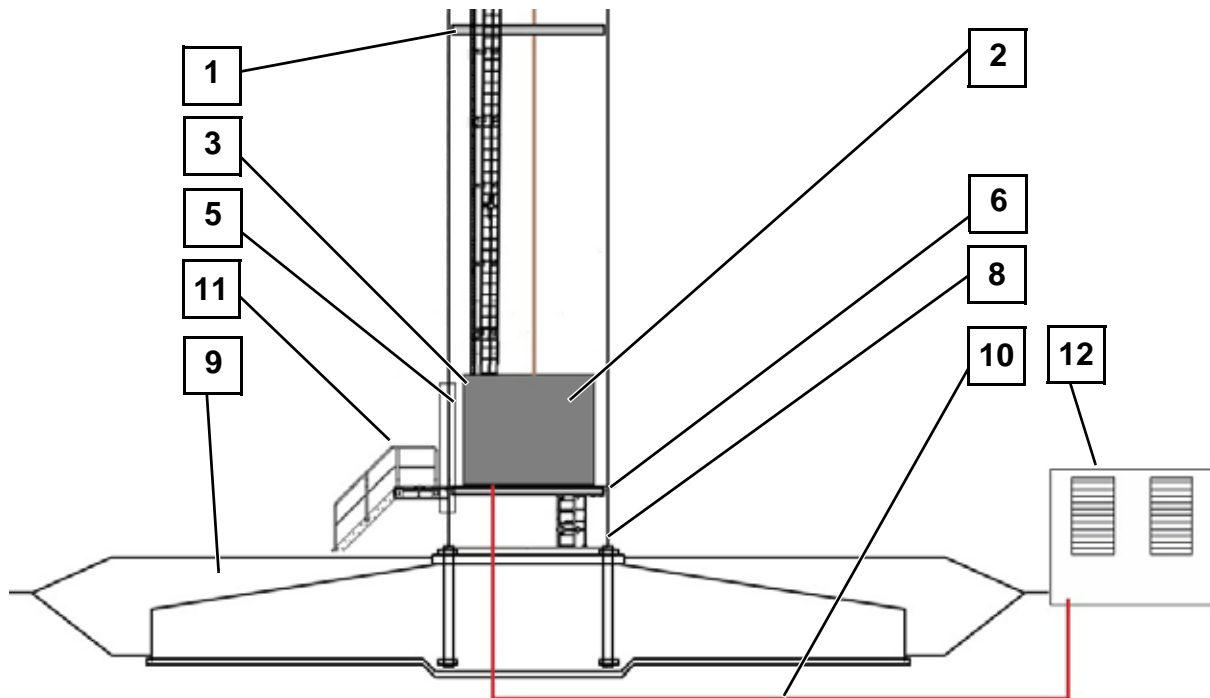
Section through the tower base, transformer outside tower (TAT) variant
